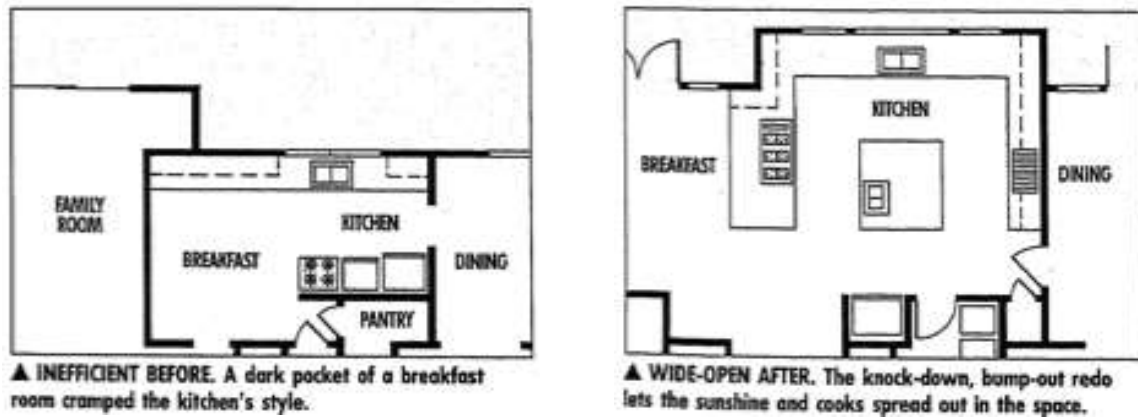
Kitchen, breakfast area, and family room. This figure shows kitchen area plans from before and after a renovation (adapted from “Made to measure,” 1989).
